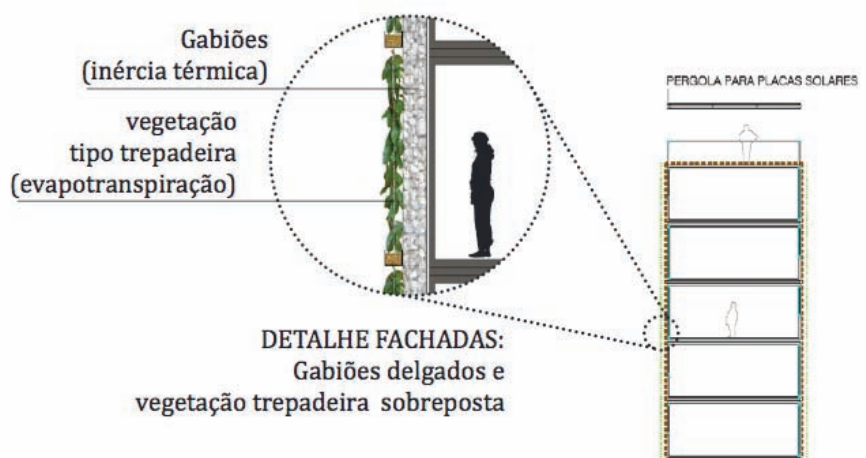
Detail of the façade system of the building in the area "Cordeiro" (Barda and França, 2011)
